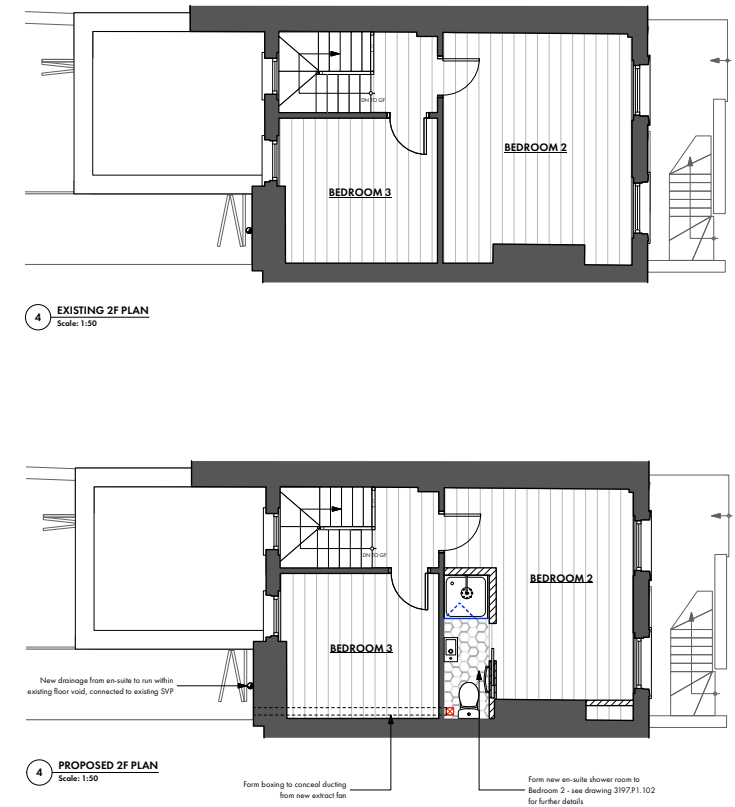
Extracts taken from planning drawing showing existing and proposed second floor plans, illustrating the formation of a new en-suite to the second floor
